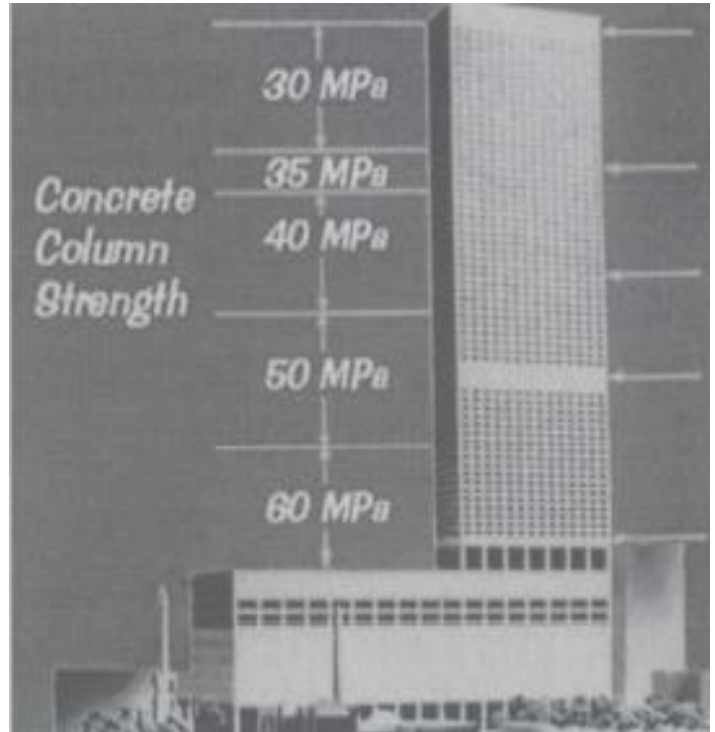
Water Tower Place, (Aïtcin, 1998).
